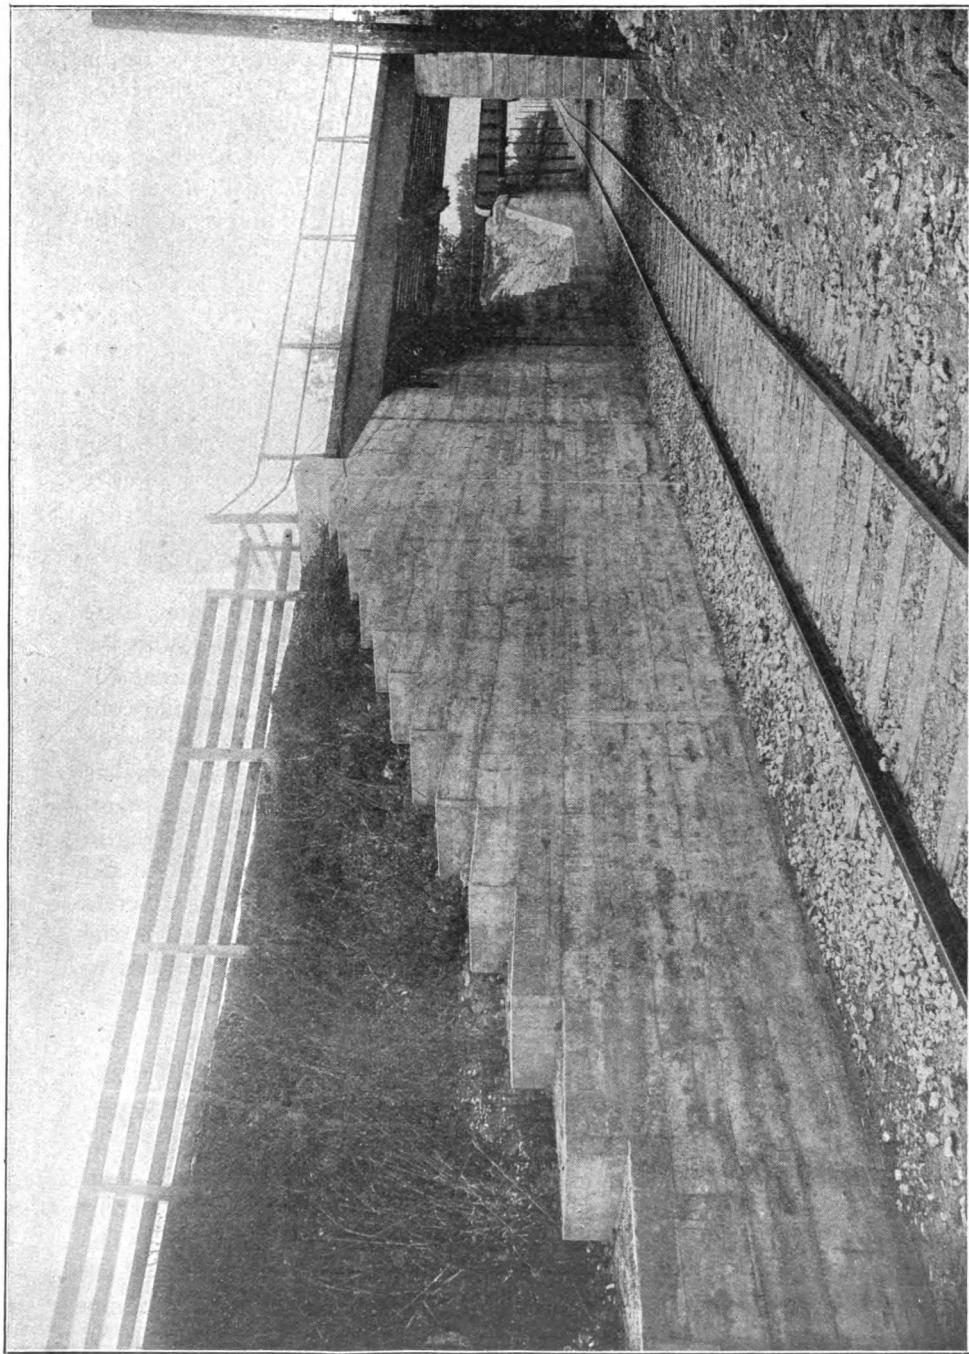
A Concrete Abutment on the T. & M. R. R., Near Toledo, Ohio.
